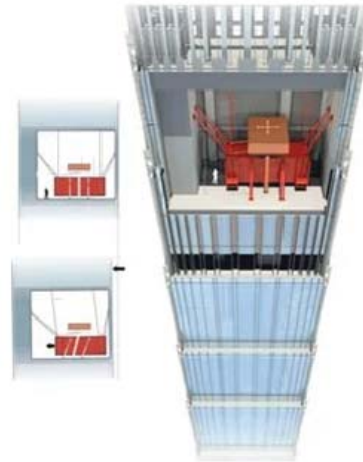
The structure of the inertial damper used in the 111 West 57th Street building.
